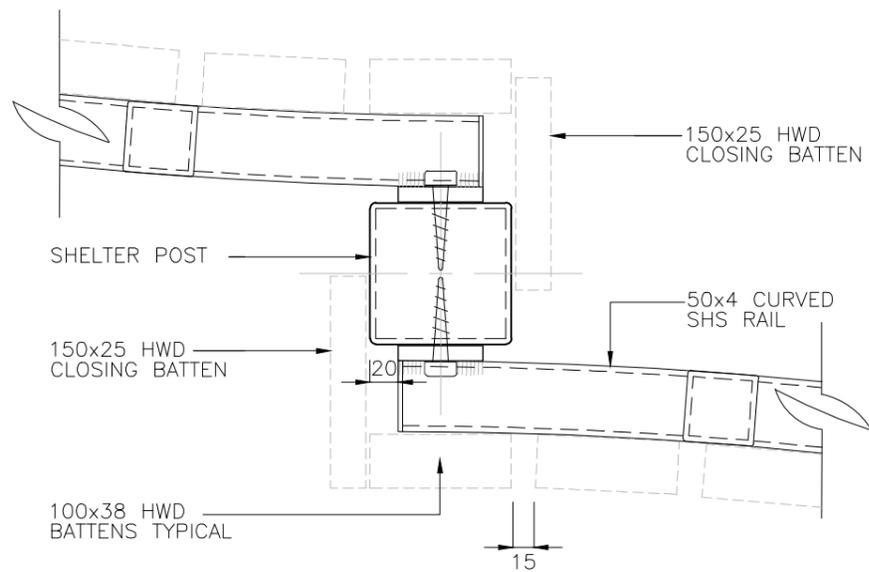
RAIL END CONNECTION TO SHELTER POST – ELEVATION
